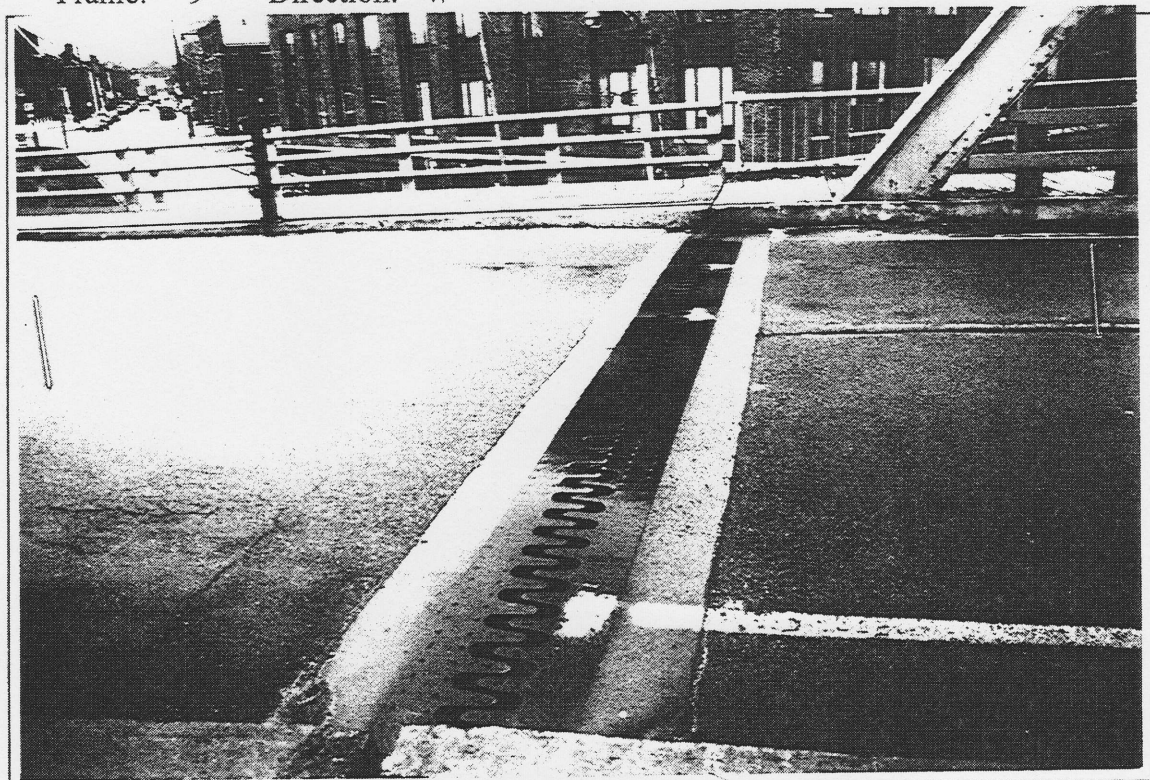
Portsmouth Approach Detail of Deck Connection to Memorial Bridge
